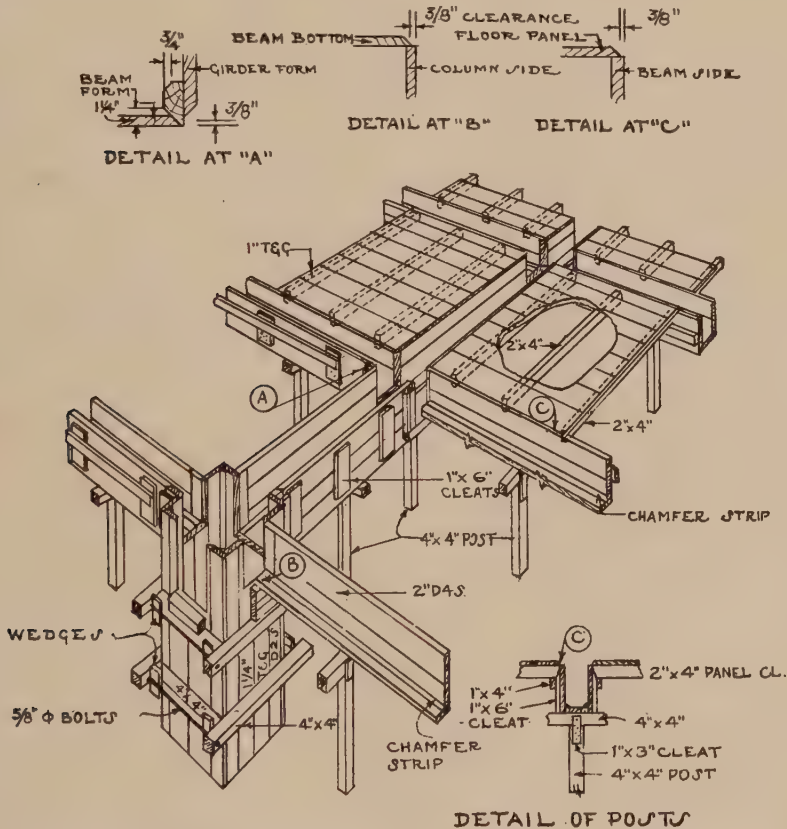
Forms for beam-and-girder floor system, showing forms which are to be completely removed as one unit.
